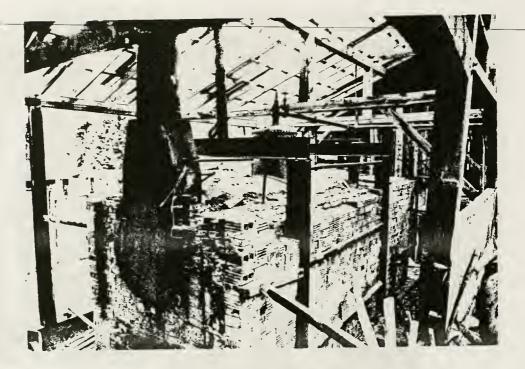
Revenue Mill (structure #34) showing steam boiler at south west corner of the mill.
